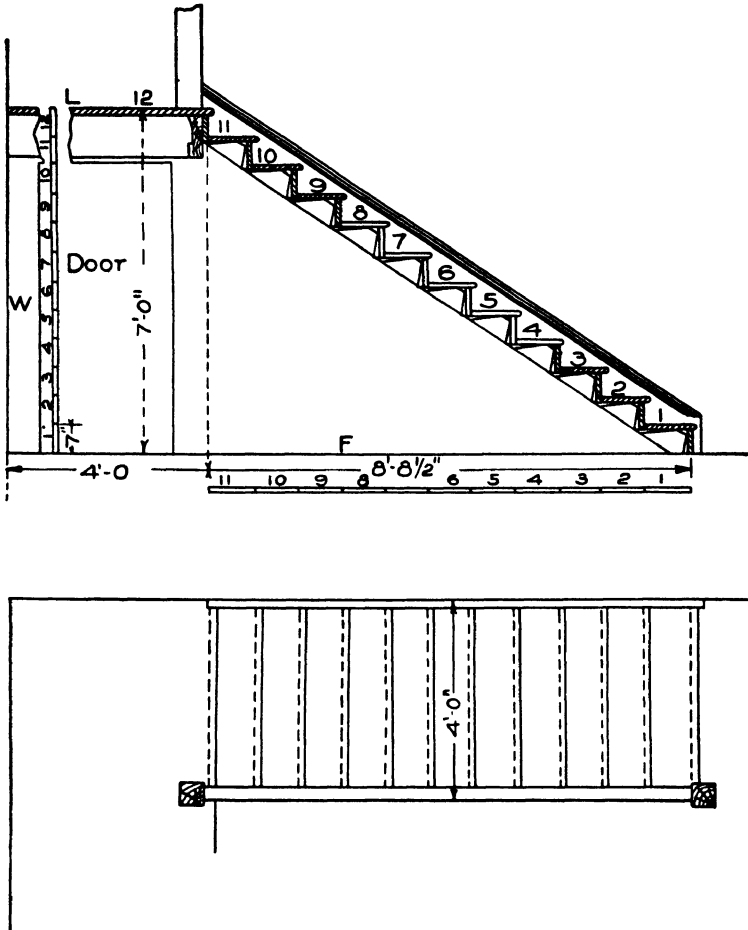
Plan and Elevation of Stair Showing Use of a Story Rod
